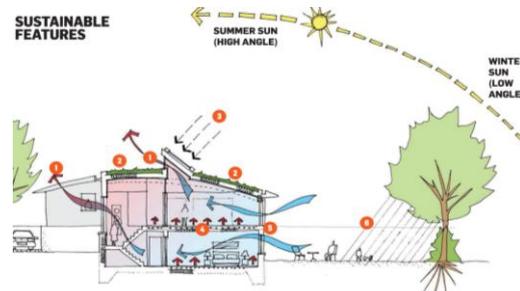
Section in green building (ZGF Architects LLP, 2009)
